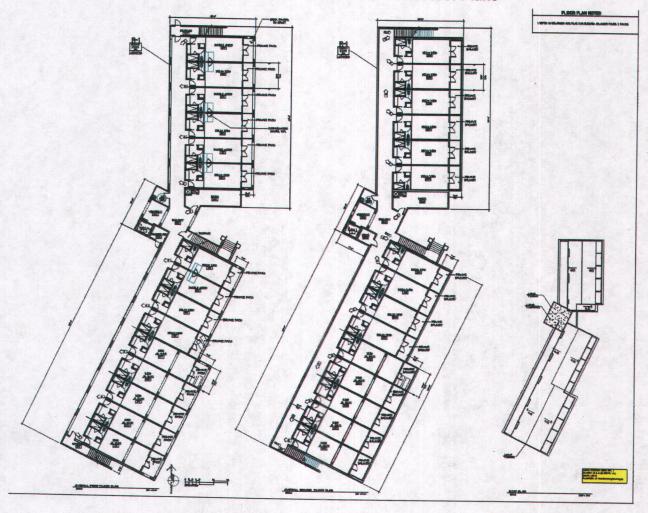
, Plot Plan No. 16891 R3 Hotel Pool Service Floor Plan
